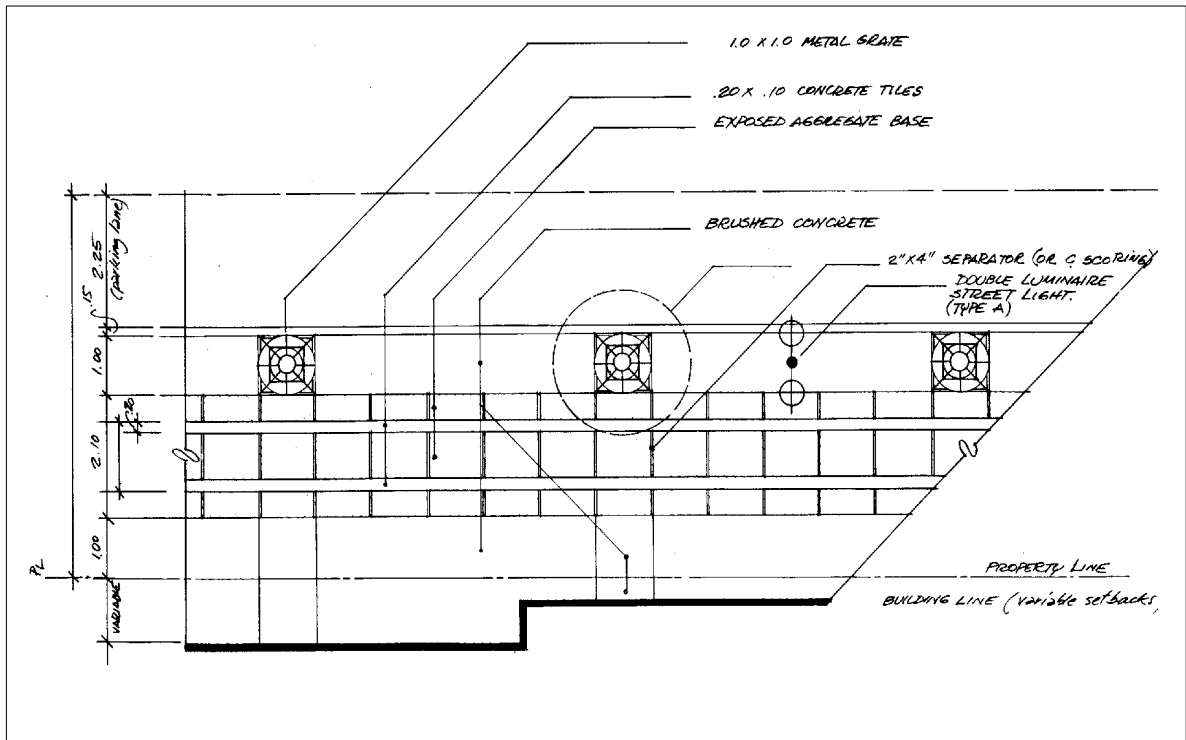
DETAIL OF SIMULATED RAILWAY TRACK (OR ACTUAL RAILS) IN SIDEWALK
